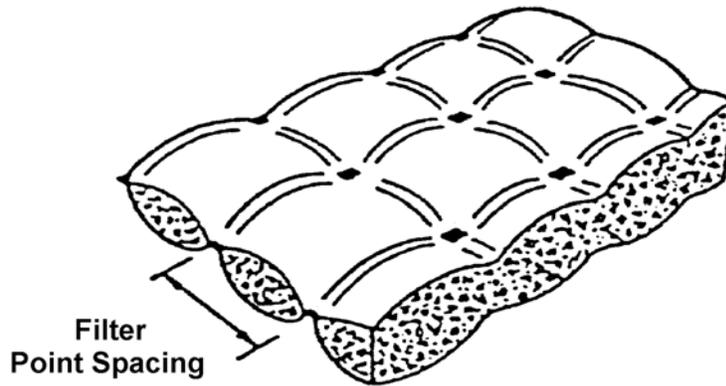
Type 1 Grouted Fabric-Formed Revetment
